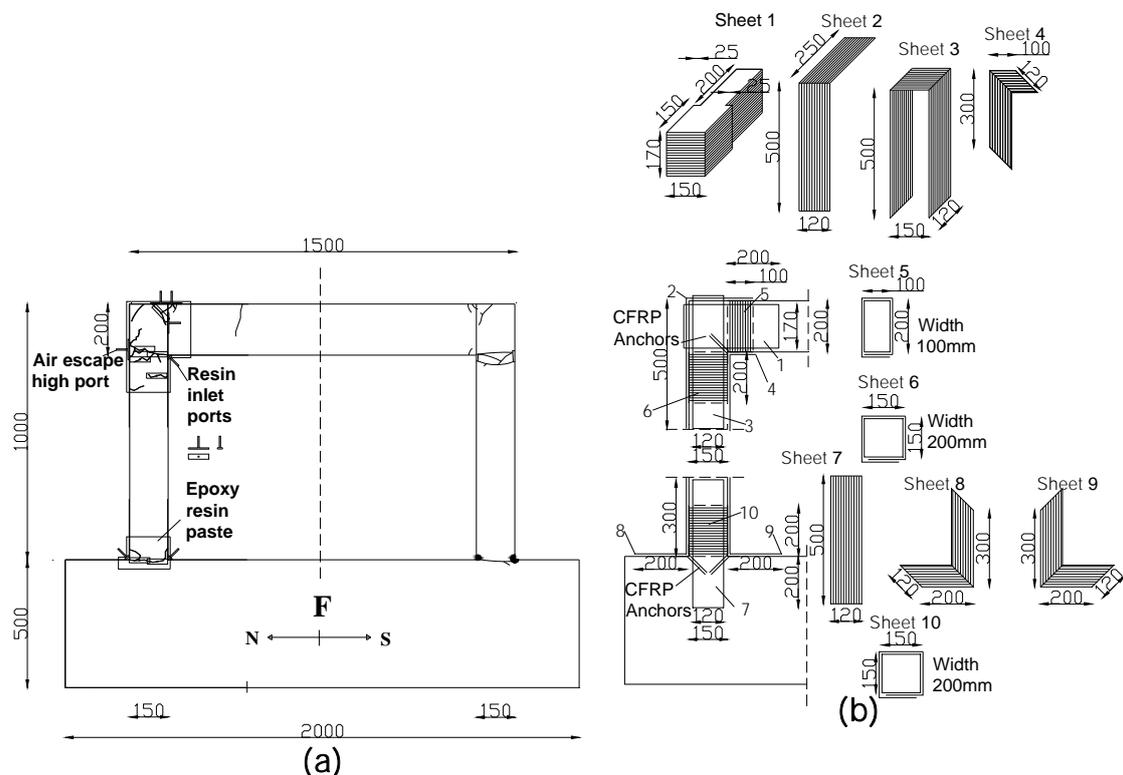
(a) Application of epoxy injections; (b) arrangement and location of CFRP sheets in Specimen F (units in mm)
